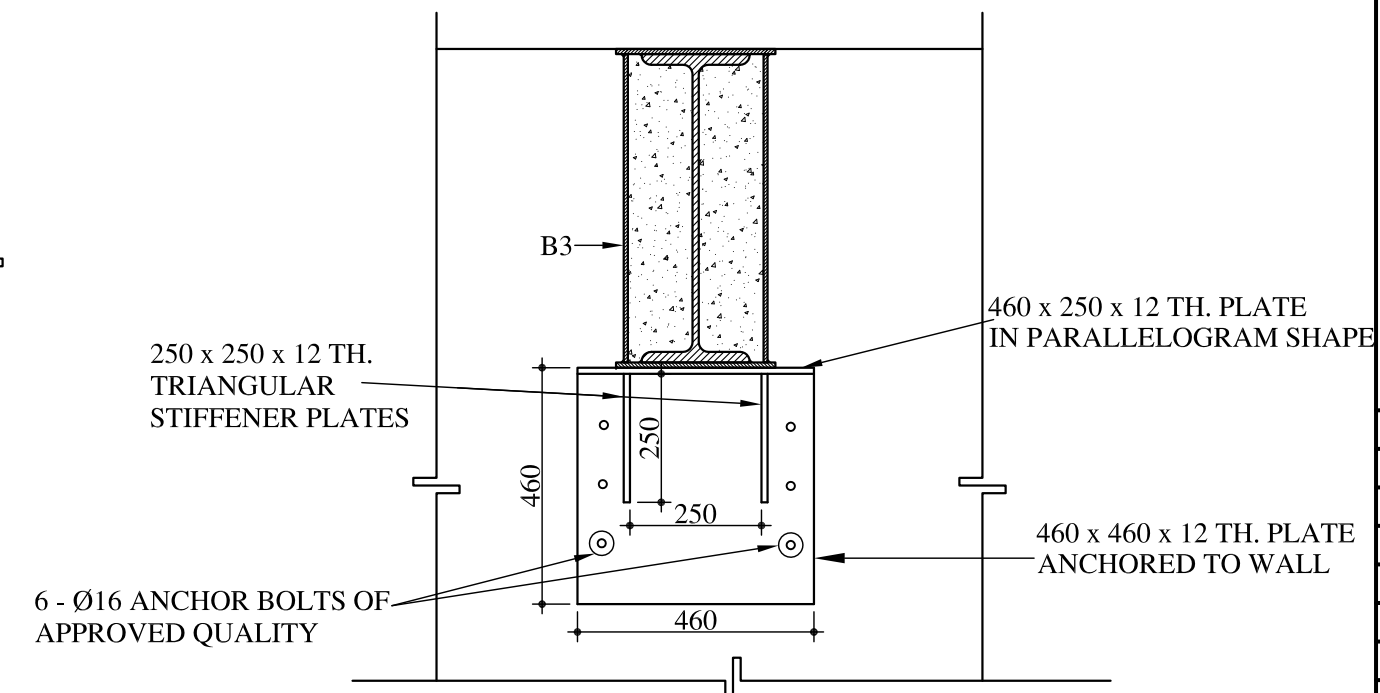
DETAIL 'X' (TYP. BOX TO BOX CONNECTION)
